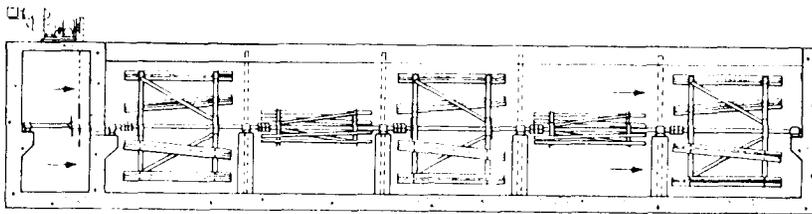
HORIZONTAL SHAFT PADDLE REEL FLOCCULATOR
